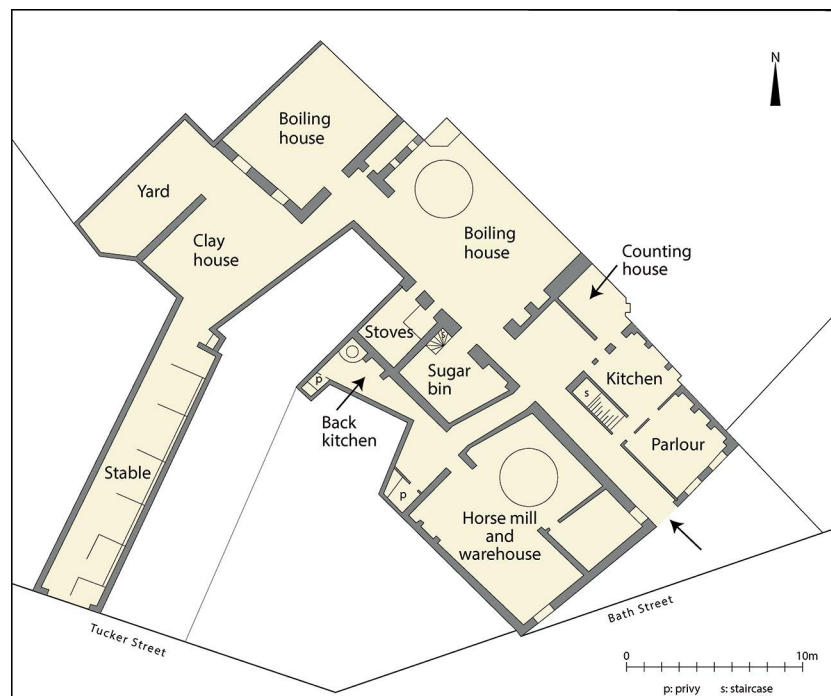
Plan of Kroger's Sugar House, Bath Road, Bristol, in 1805, showing the main rooms and spaces (after Jackson 2006, fig. 10) (© Alejandra Gutiérrez)
